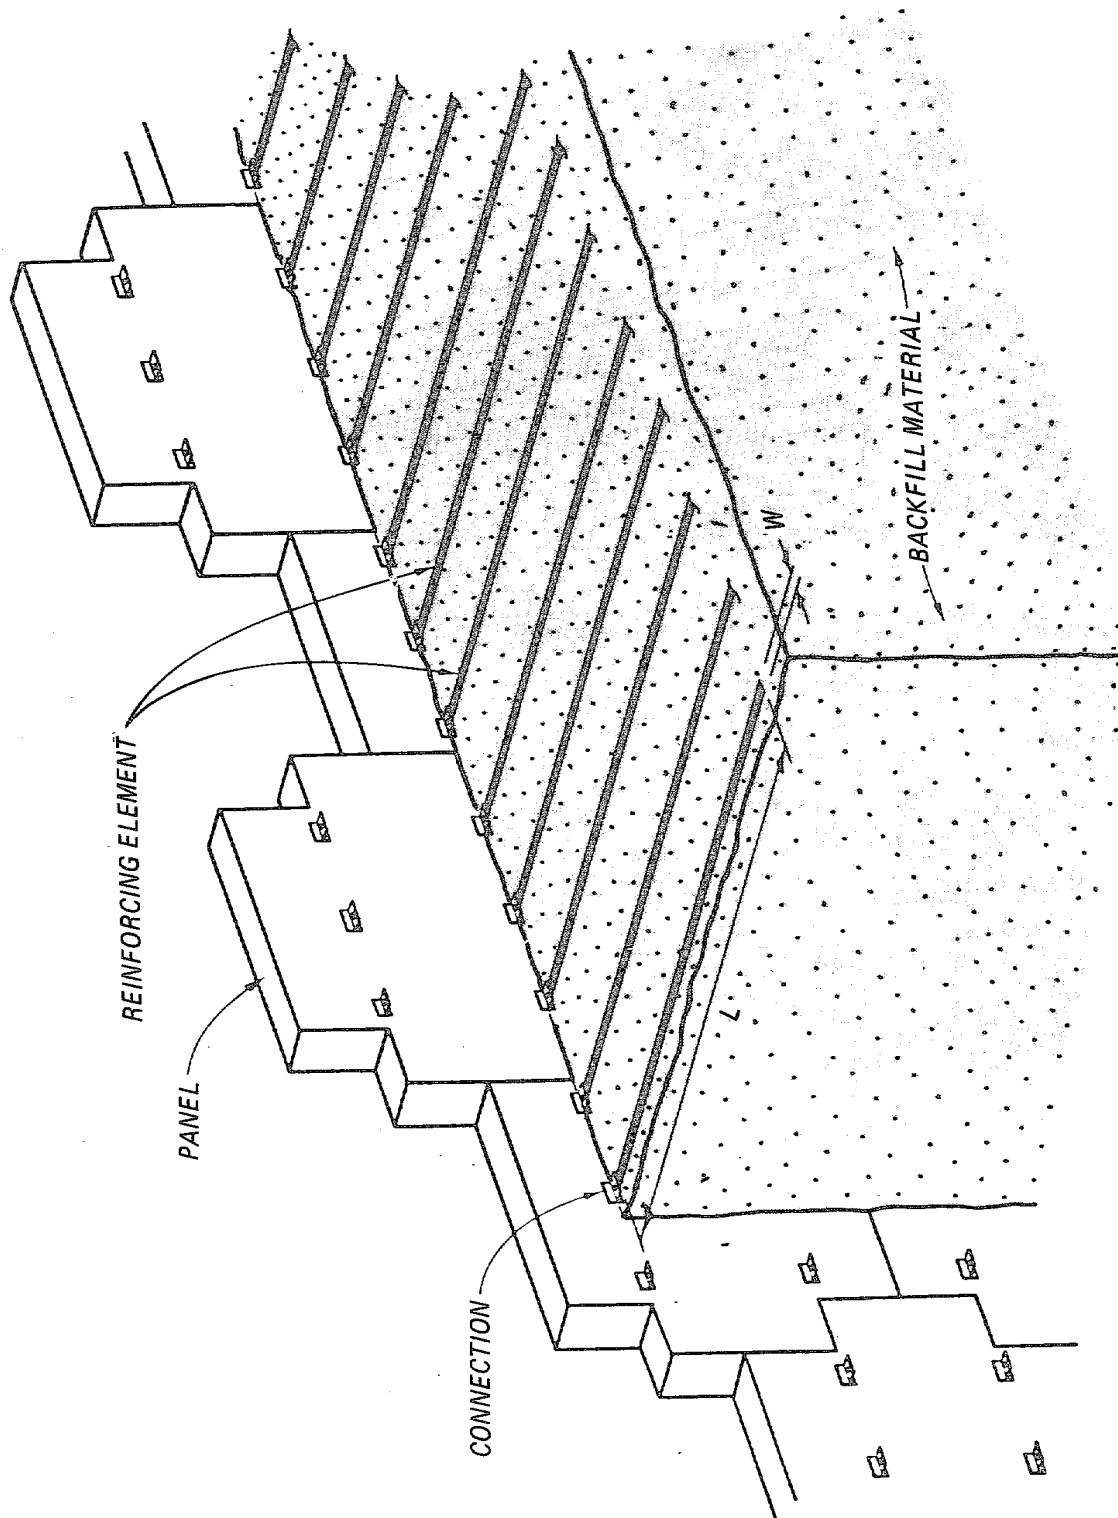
Schematic diagram of reinforced earth retaining wall
